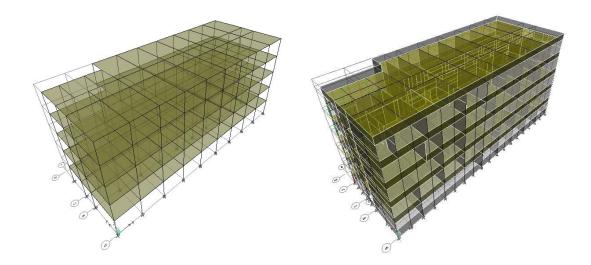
FCCIA building – model 1 (left, only structural elements) and model 2 (right, complete model) In Figure 4.2 are presented the first three vibration mode shapes of the complete model of building.
